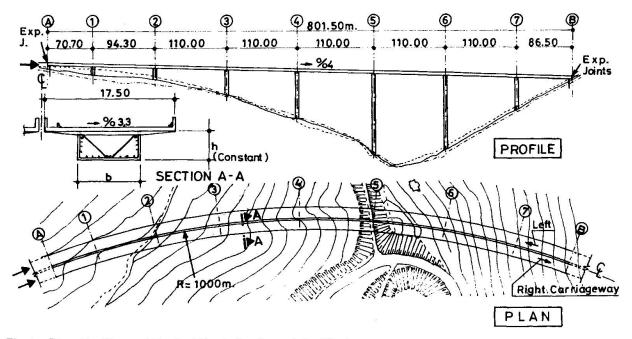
Plan, Profile and Typical Deck Section of the Viaduct.
